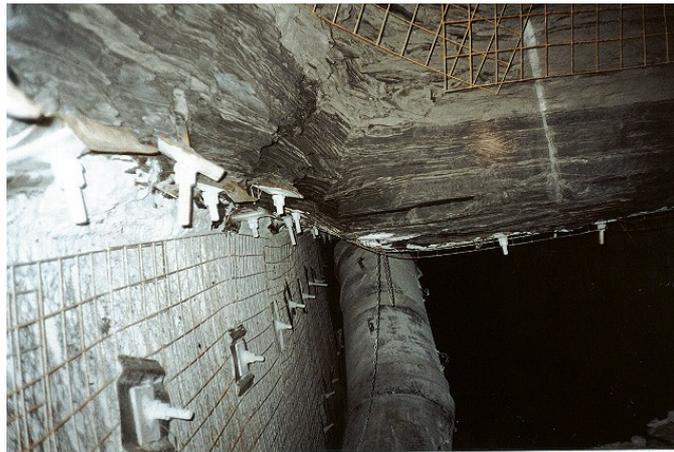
Inbye lip of roof fall stopping at the 6:2 pattern showing line of roof failure.
